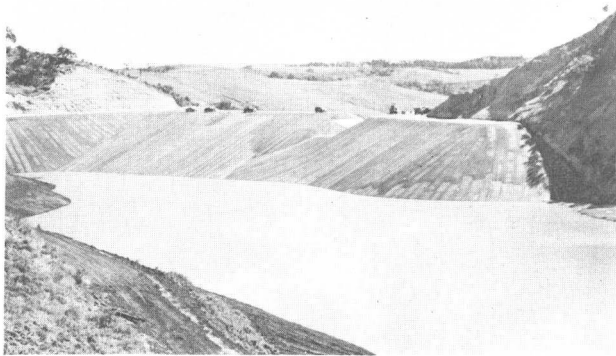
Asphalt Concrete Facing, Glen Anne Dam
